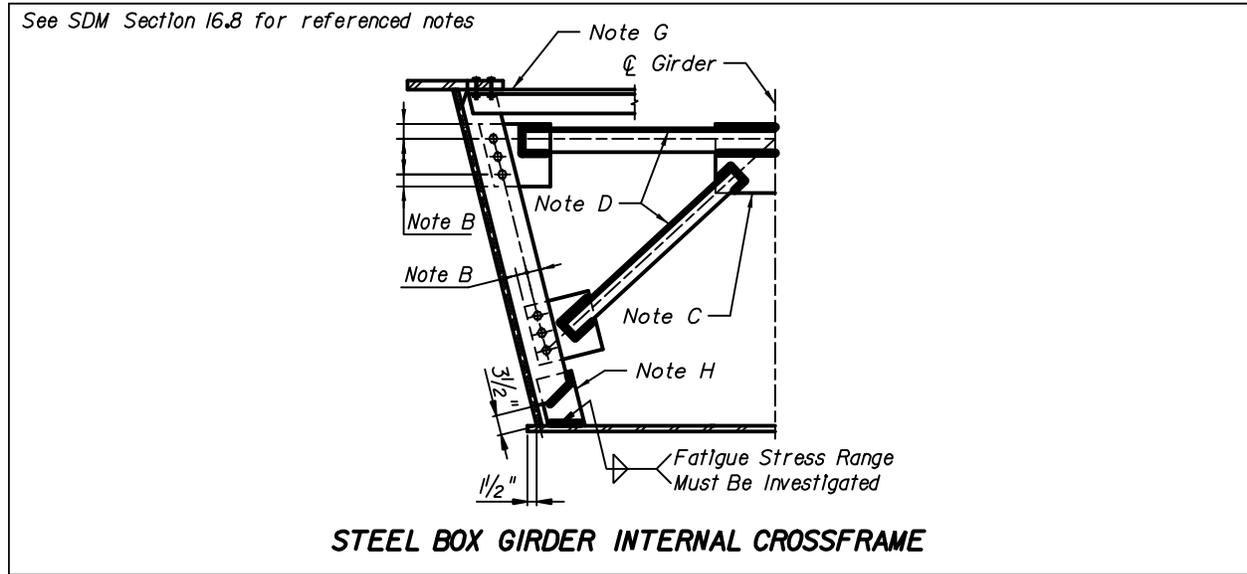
Steel Box Girder Crossframe with Longitudinal Stiffener
